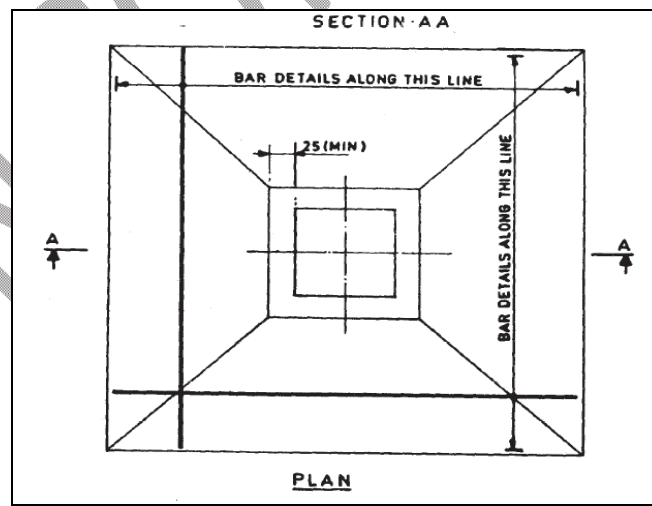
Typical detailing (plan) of an isolated footing as described in SP 34
